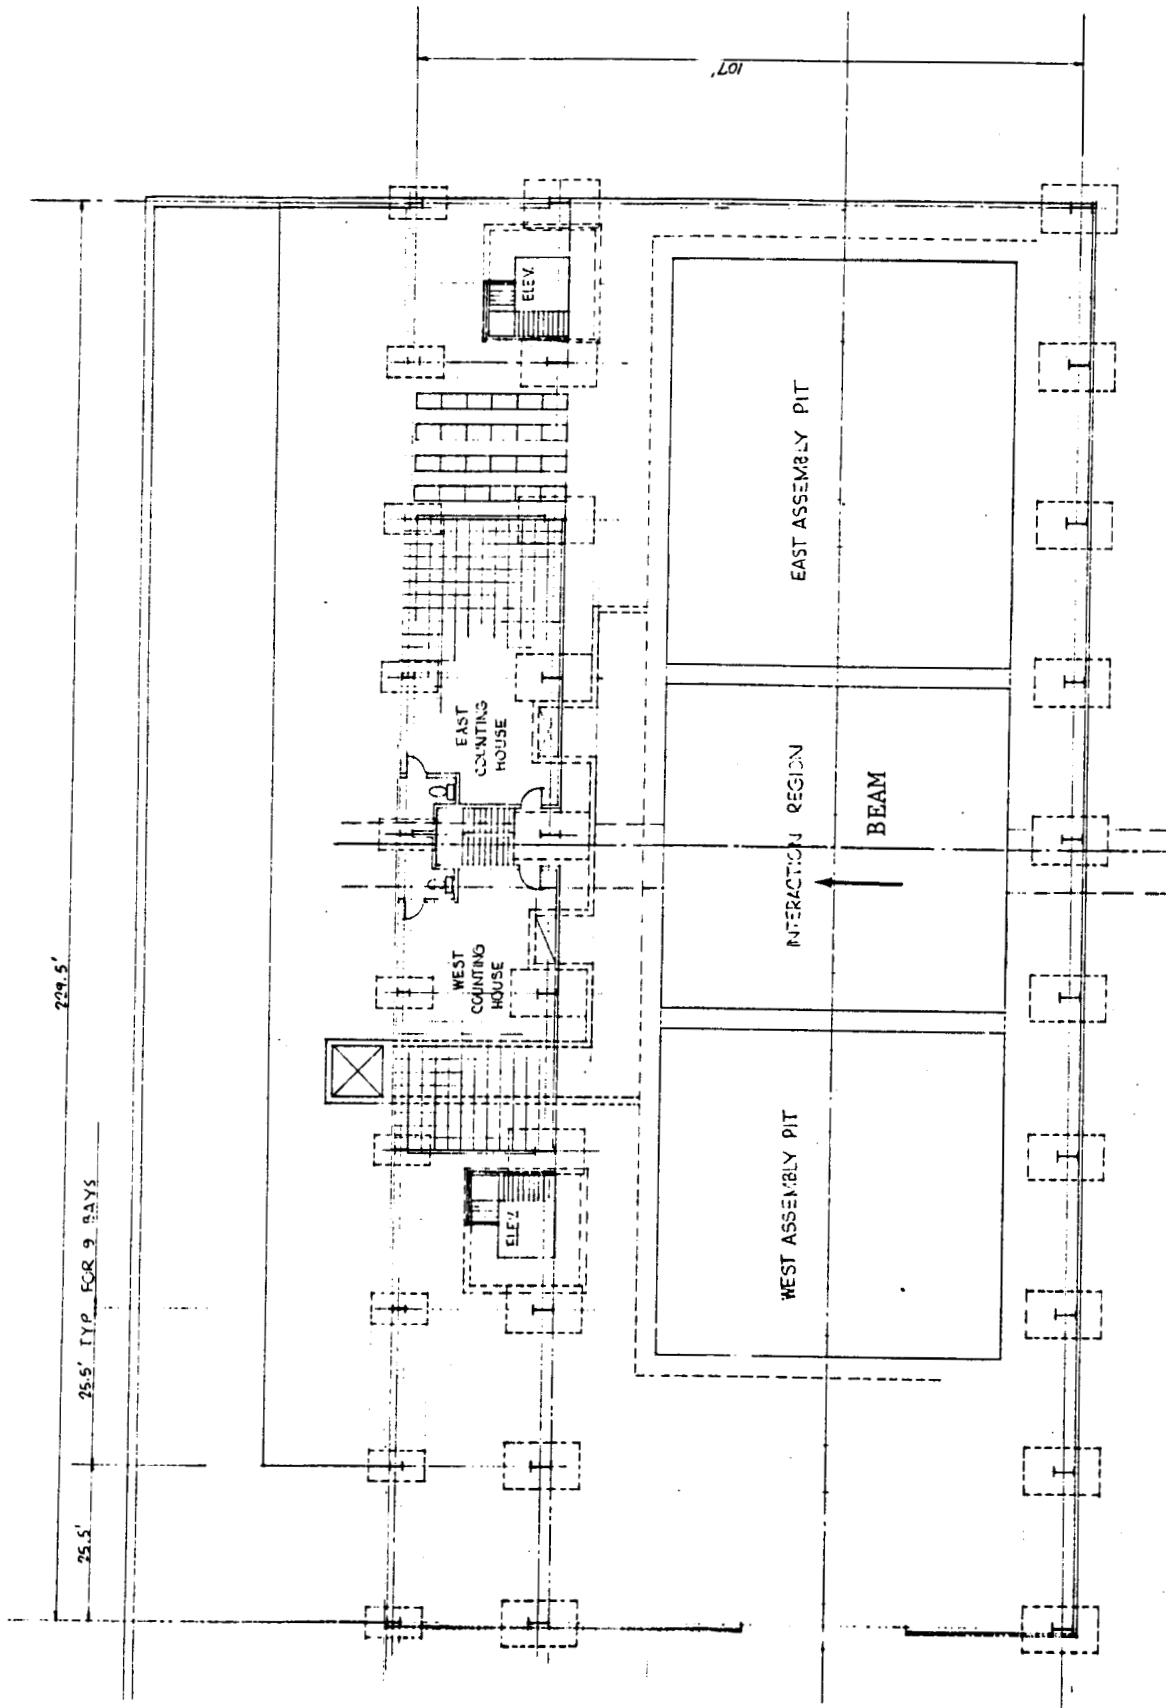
Floor Plan of SLC Interaction Hall
